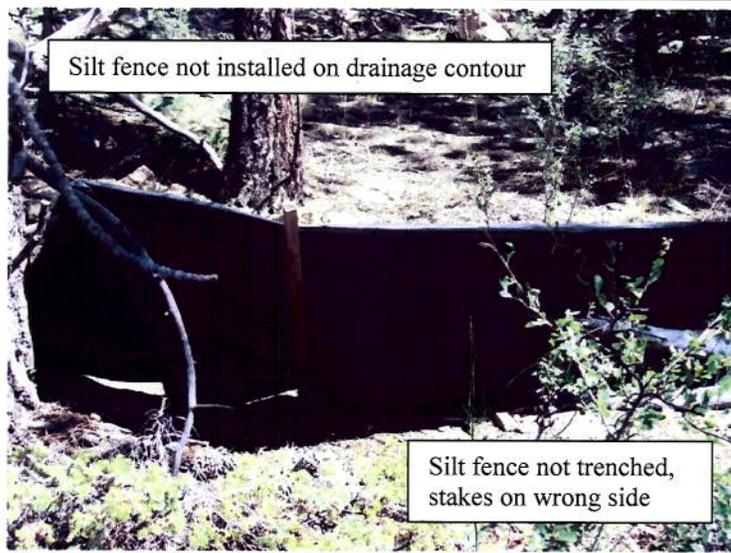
Silt fence located along the southern boundary, north of Avenue of the All Stars and east of Richman Street
